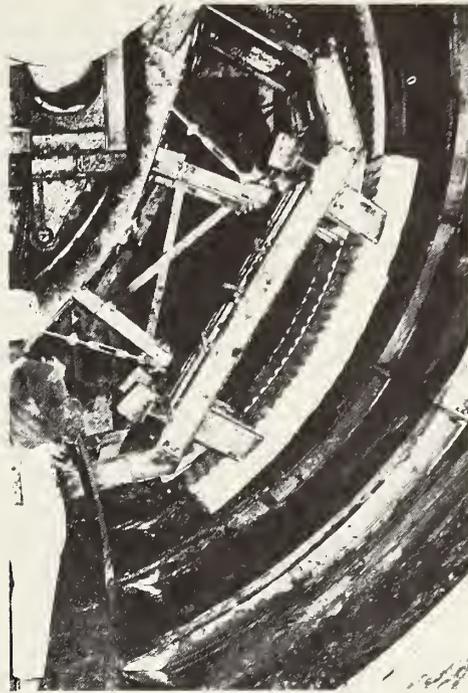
Installation of Prefabricated Segments with Erector Behind Basic Machine. Steel Rings Have Been Previously Installed Directly Behind Cutting Head Carrier
